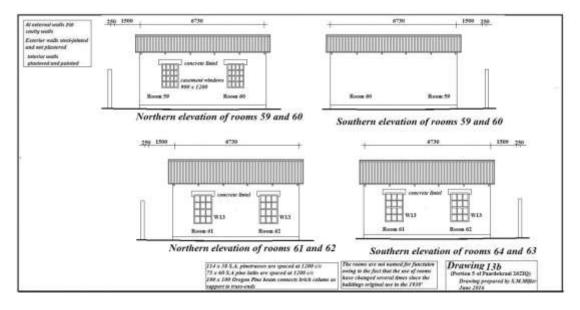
Above. Northern and Southern elevations of the buildings captured in Drawing 13. (Drawing S.M. Miller 2016.)
